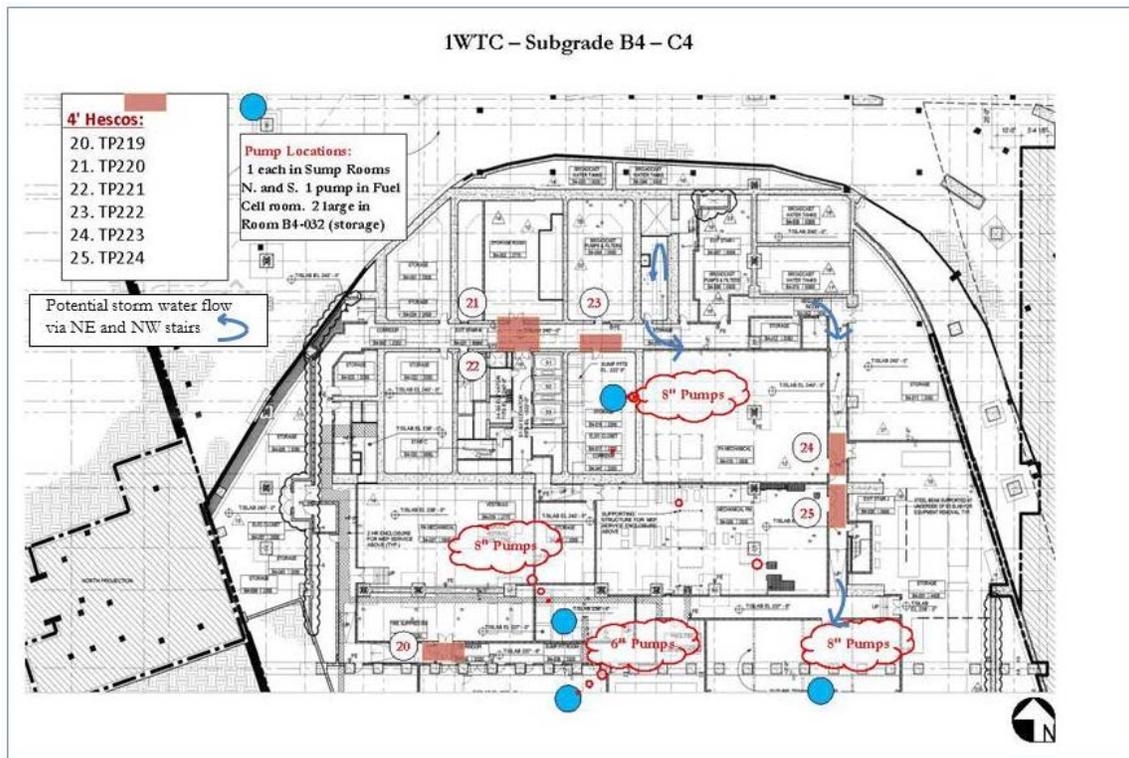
Subgrade Barrier Plan for 1WTC, Floor C4
